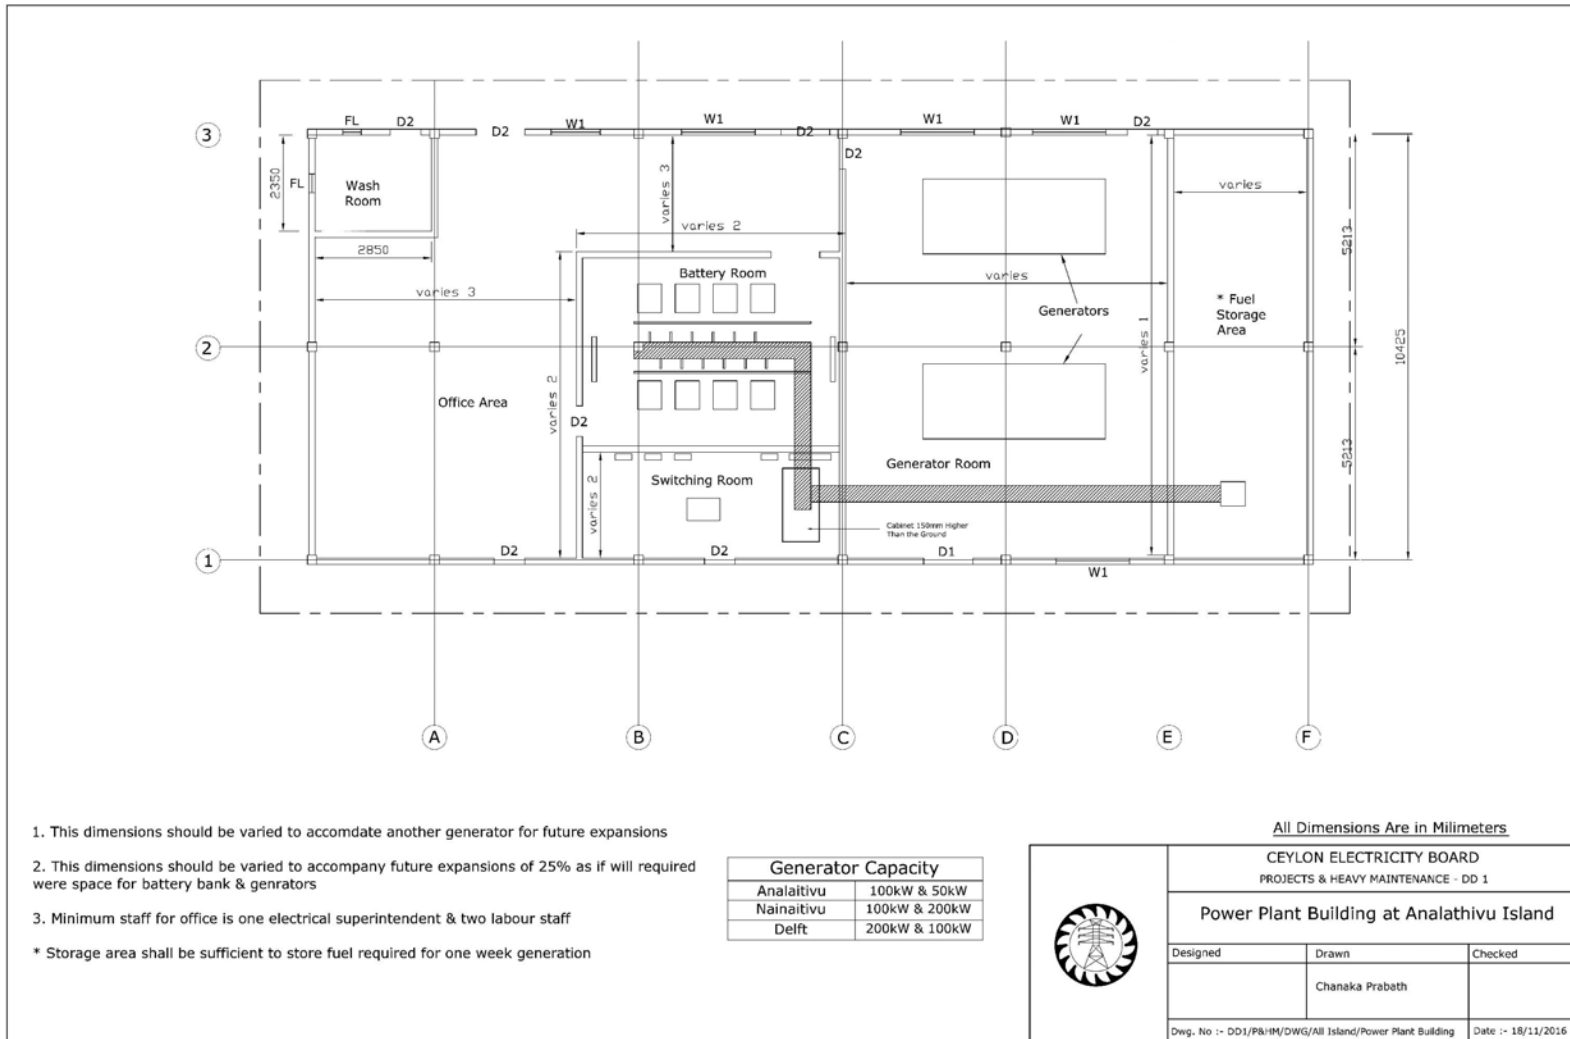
Floors and Sections Arrangement of Power Plant Building for Delft, Analativu and Nainativu
